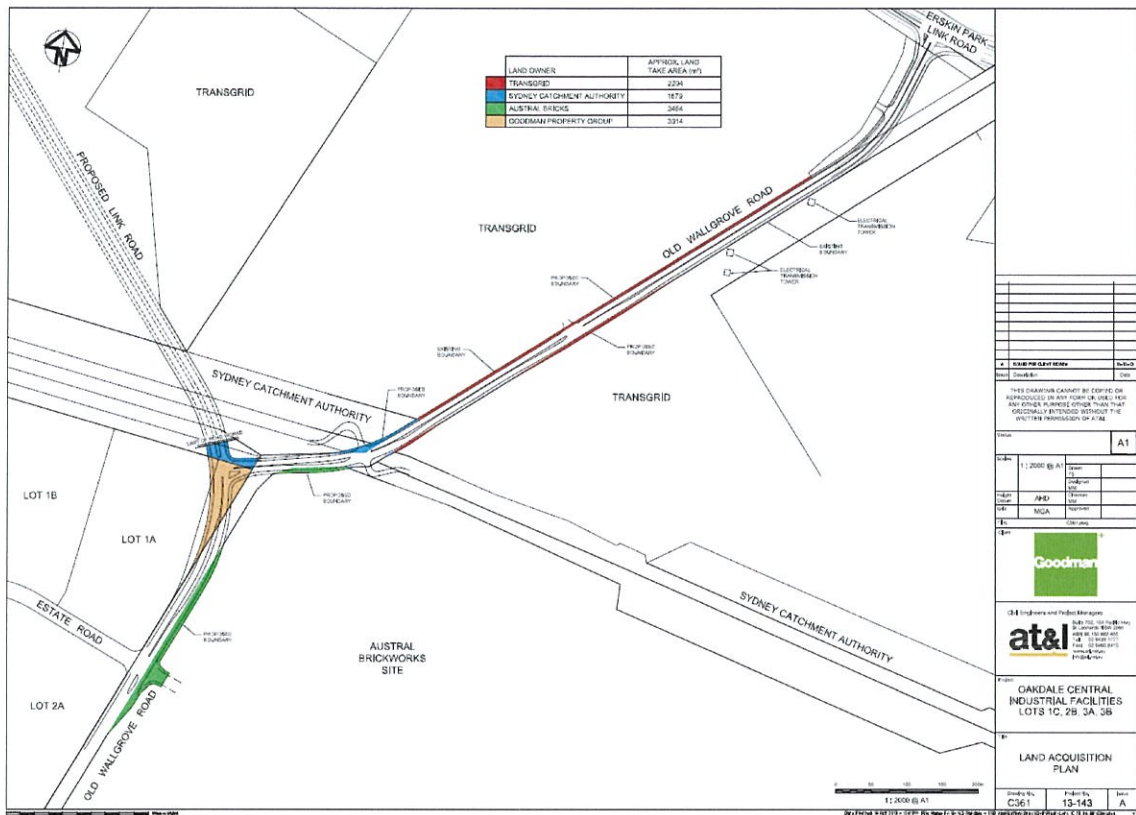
The proposed extent of Old Wallgrove Road Upgrade. (Source: McKenzie Group, 2014)
